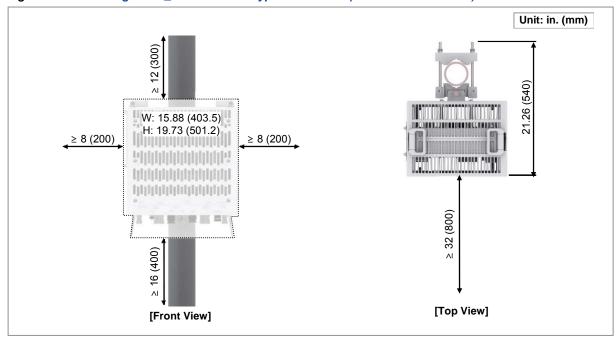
RRH Arrangement\_1 Sector Pole Type Installation (Side Installation)
